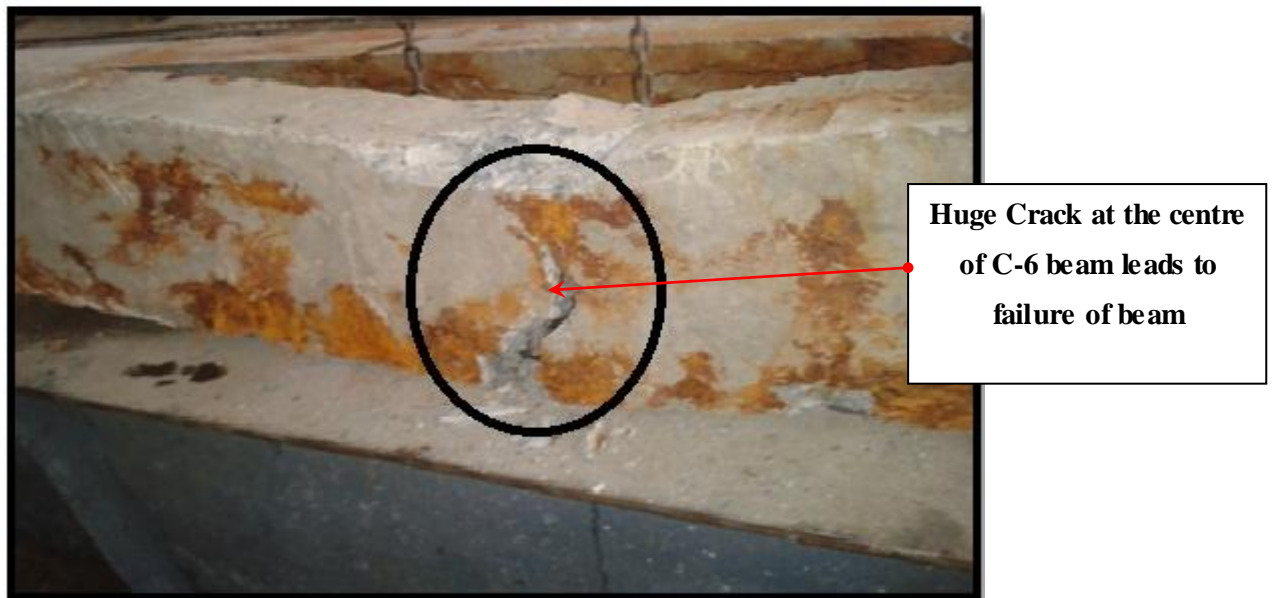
C-6 beam showing huge crack at centre after failure
